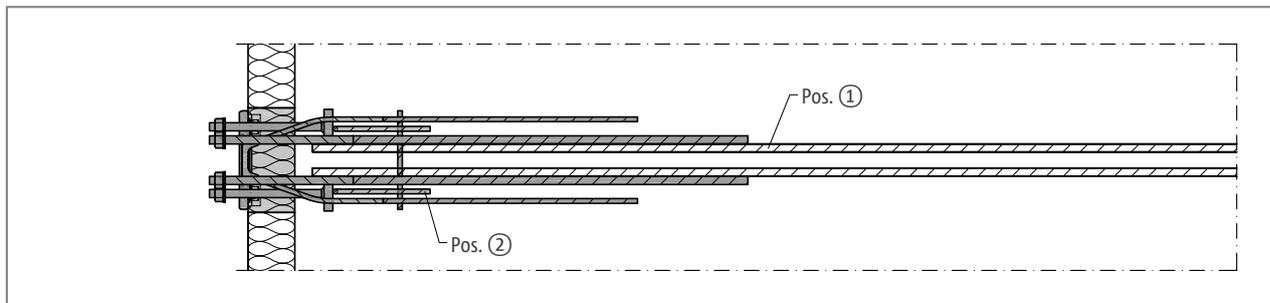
Schöck Isokorb® T type SK-M1: On-site reinforcement: Plan view
